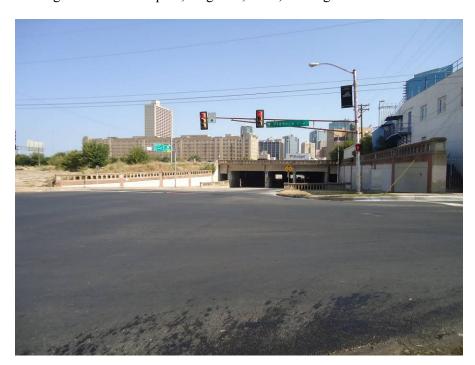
Jennings Avenue Underpass, August 5, 2015, looking northeast at approach to tunnel from West Vickery Boulevard
